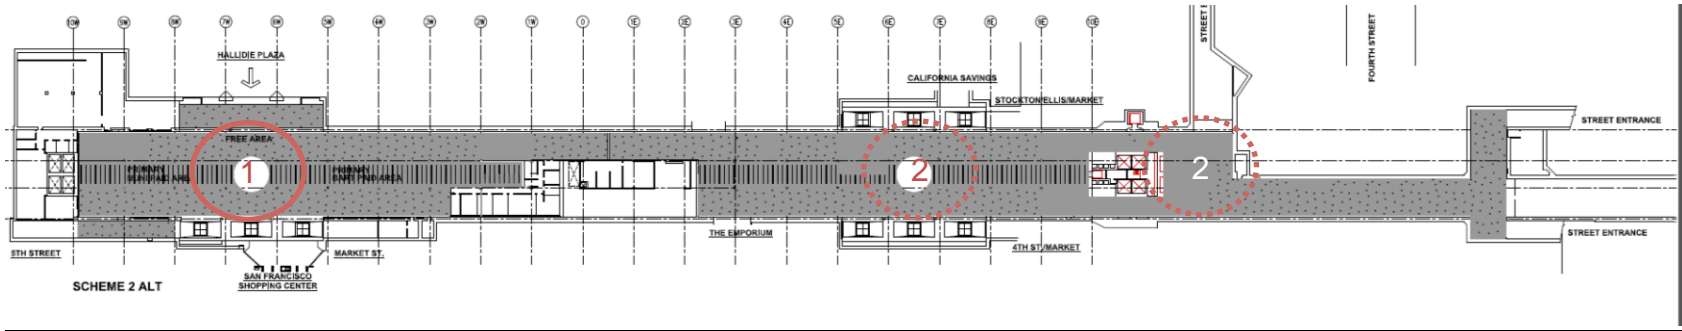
Concourse Level Site Plan showing current (1) and future envisioned (2) permanent art sites
